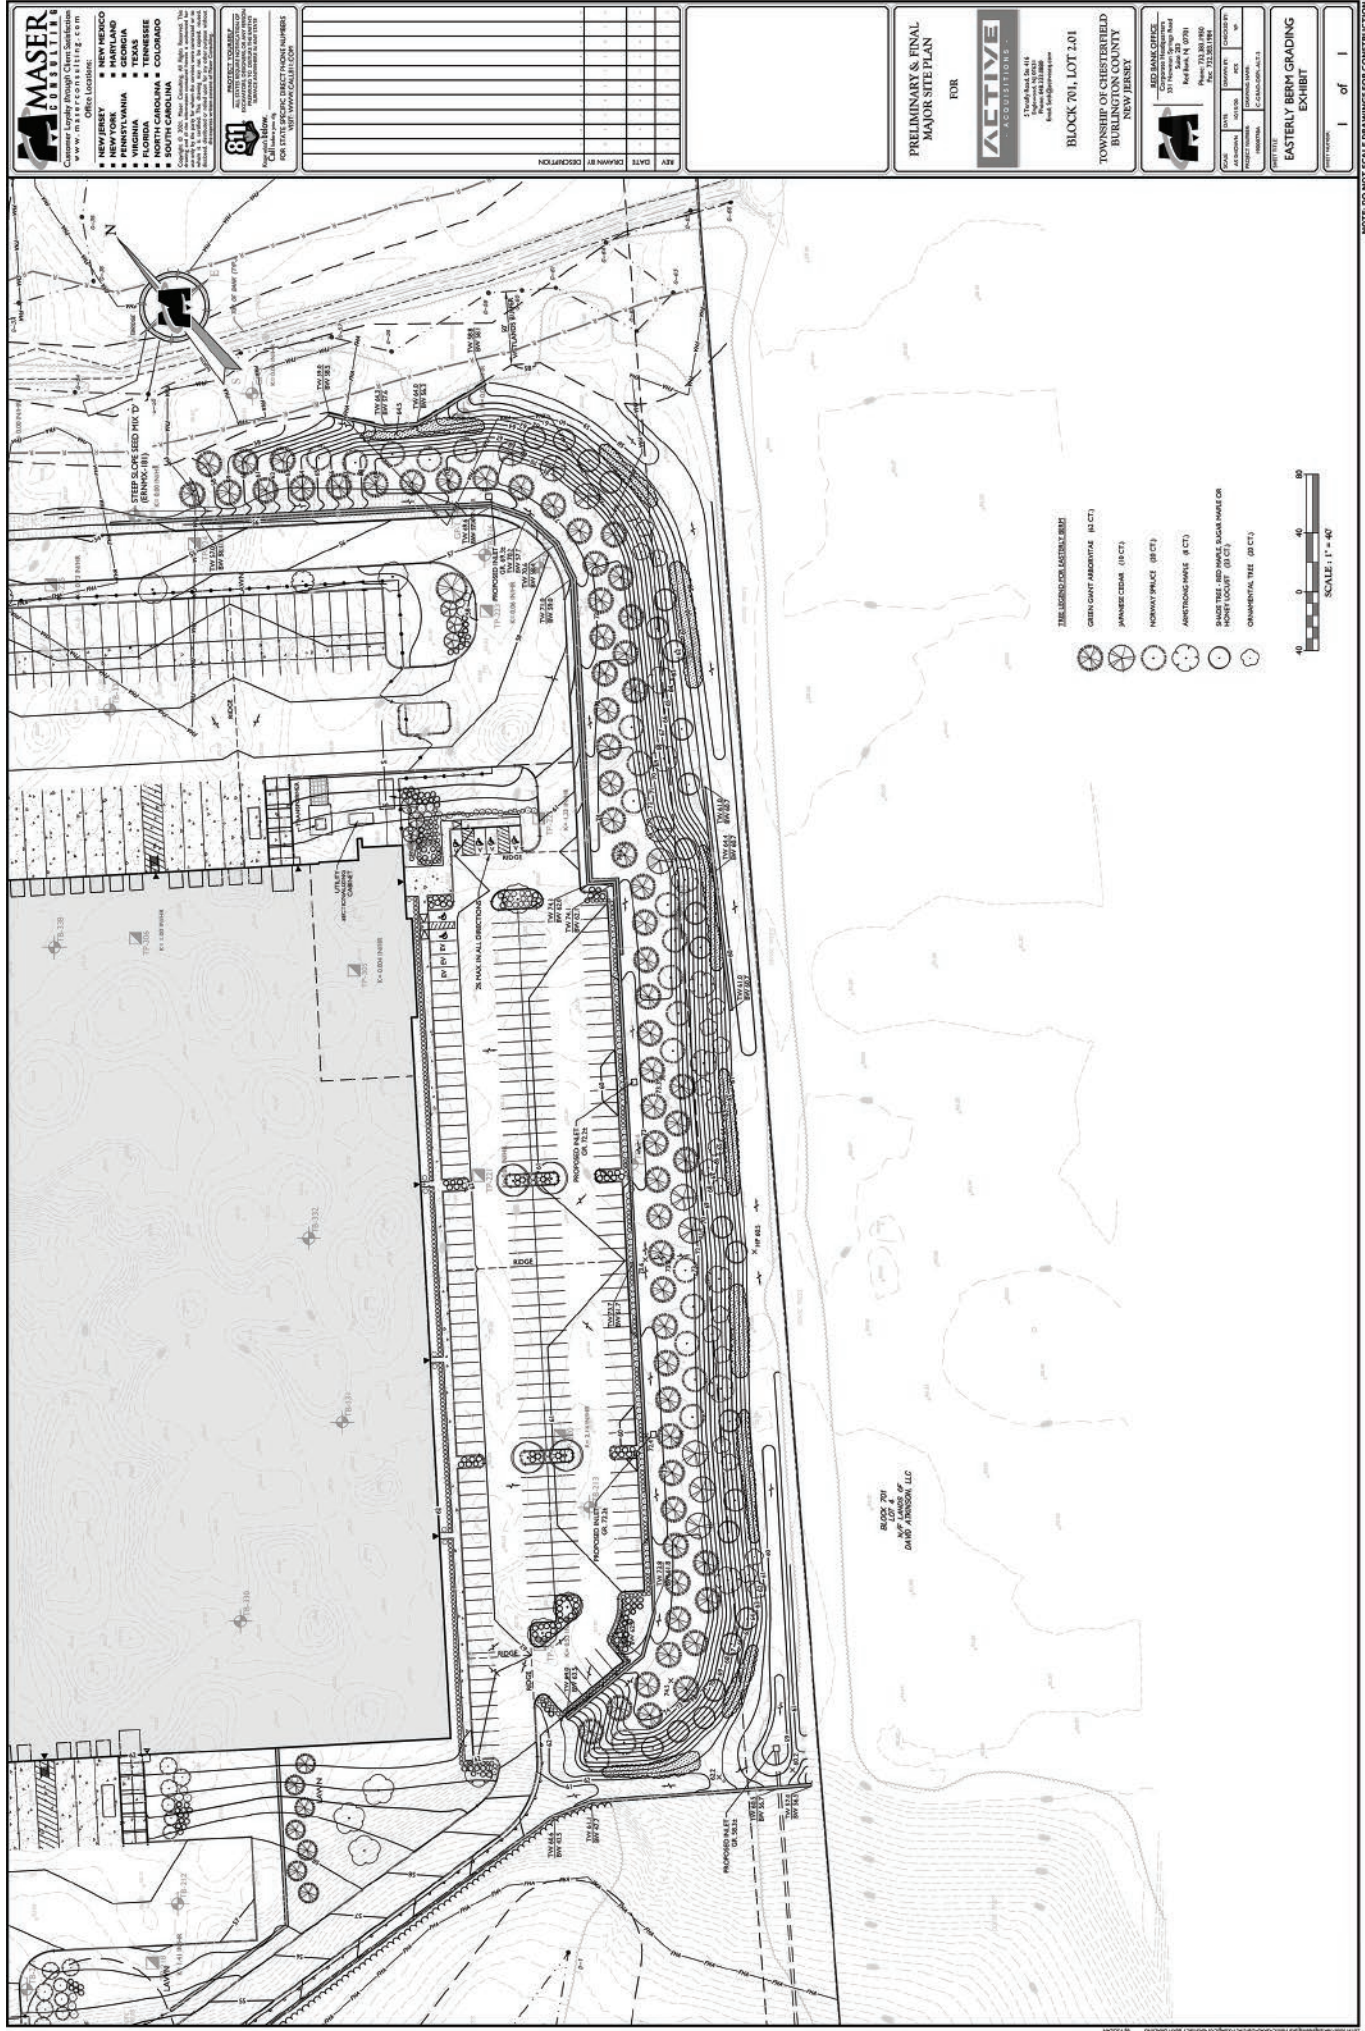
Conceptual Plan for Easterly Buffer | Old York Redevelopment Plan
